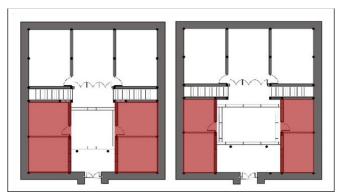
Adjustment of the dimensions of side rooms Source: Author (2024)
